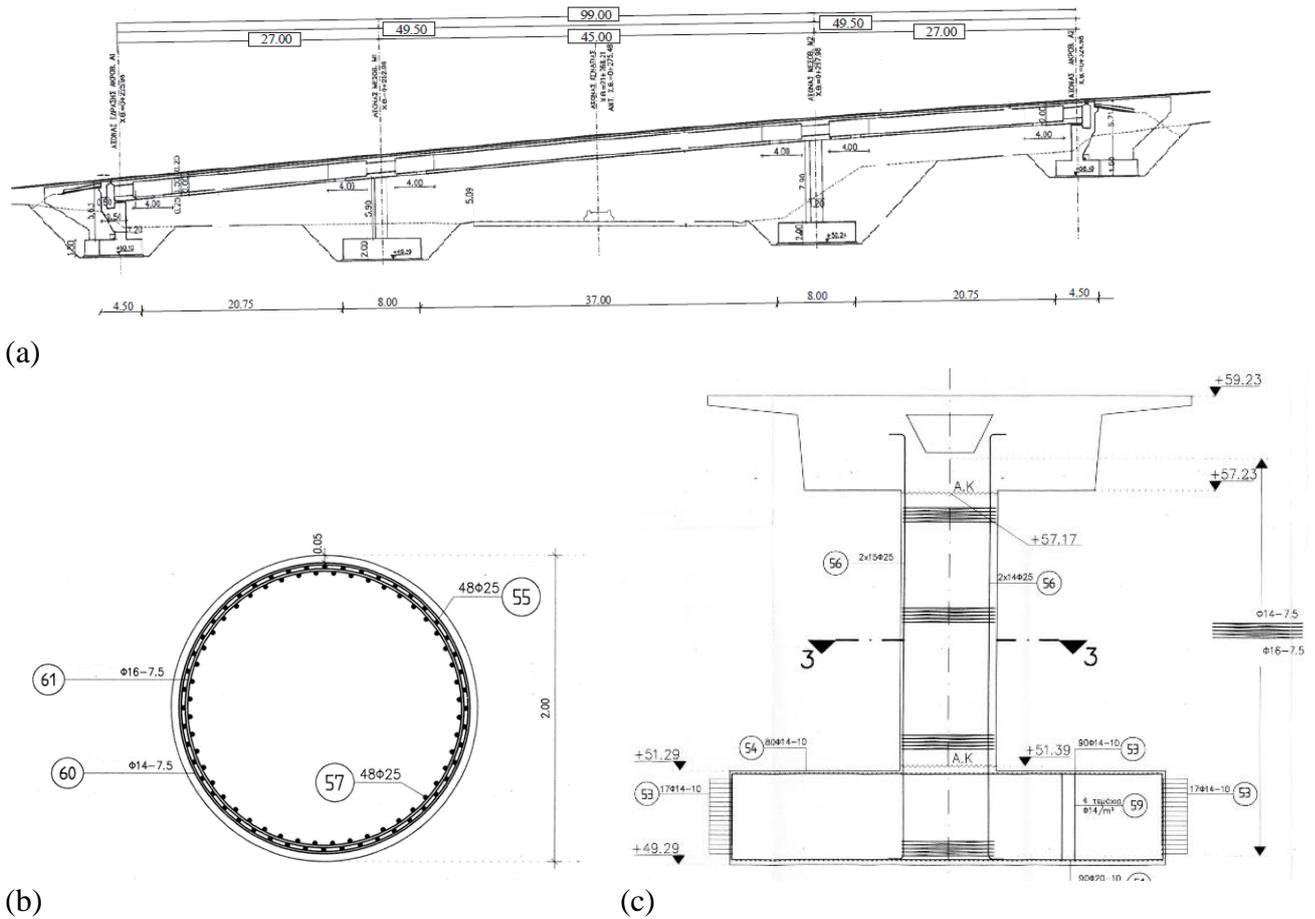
(a) Longitudinal section of the bridge, (b) Pier section, (c) Section close to pier
